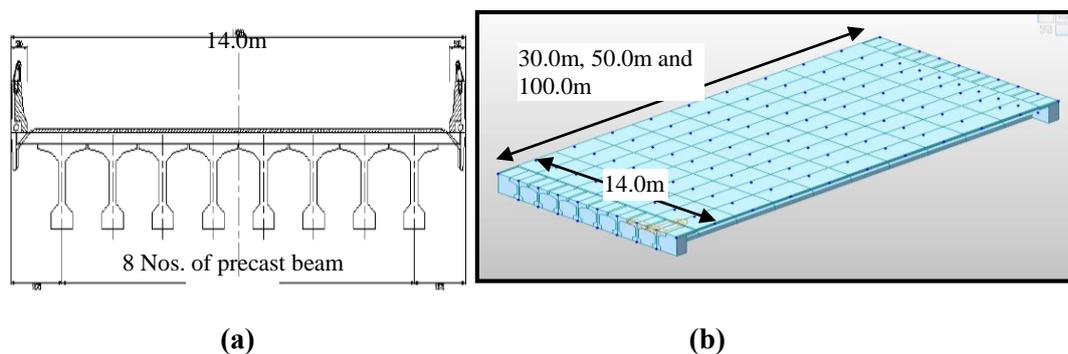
(a) Simple beam bridge deck of 14.0m wide and (b) the grillage model of the bridge deck
